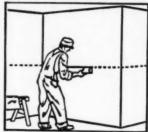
First remove all high spots on the walls and build up low spots with patching plaster. All corners must be straight and level and all walls thoroughly dry. Wire brush papered or painted surfaces before cementing the panels to walls. Find the lowest point in the floor, allow for the base, and measure up from this to the height of the panel. Establish a level line at that point around the room
